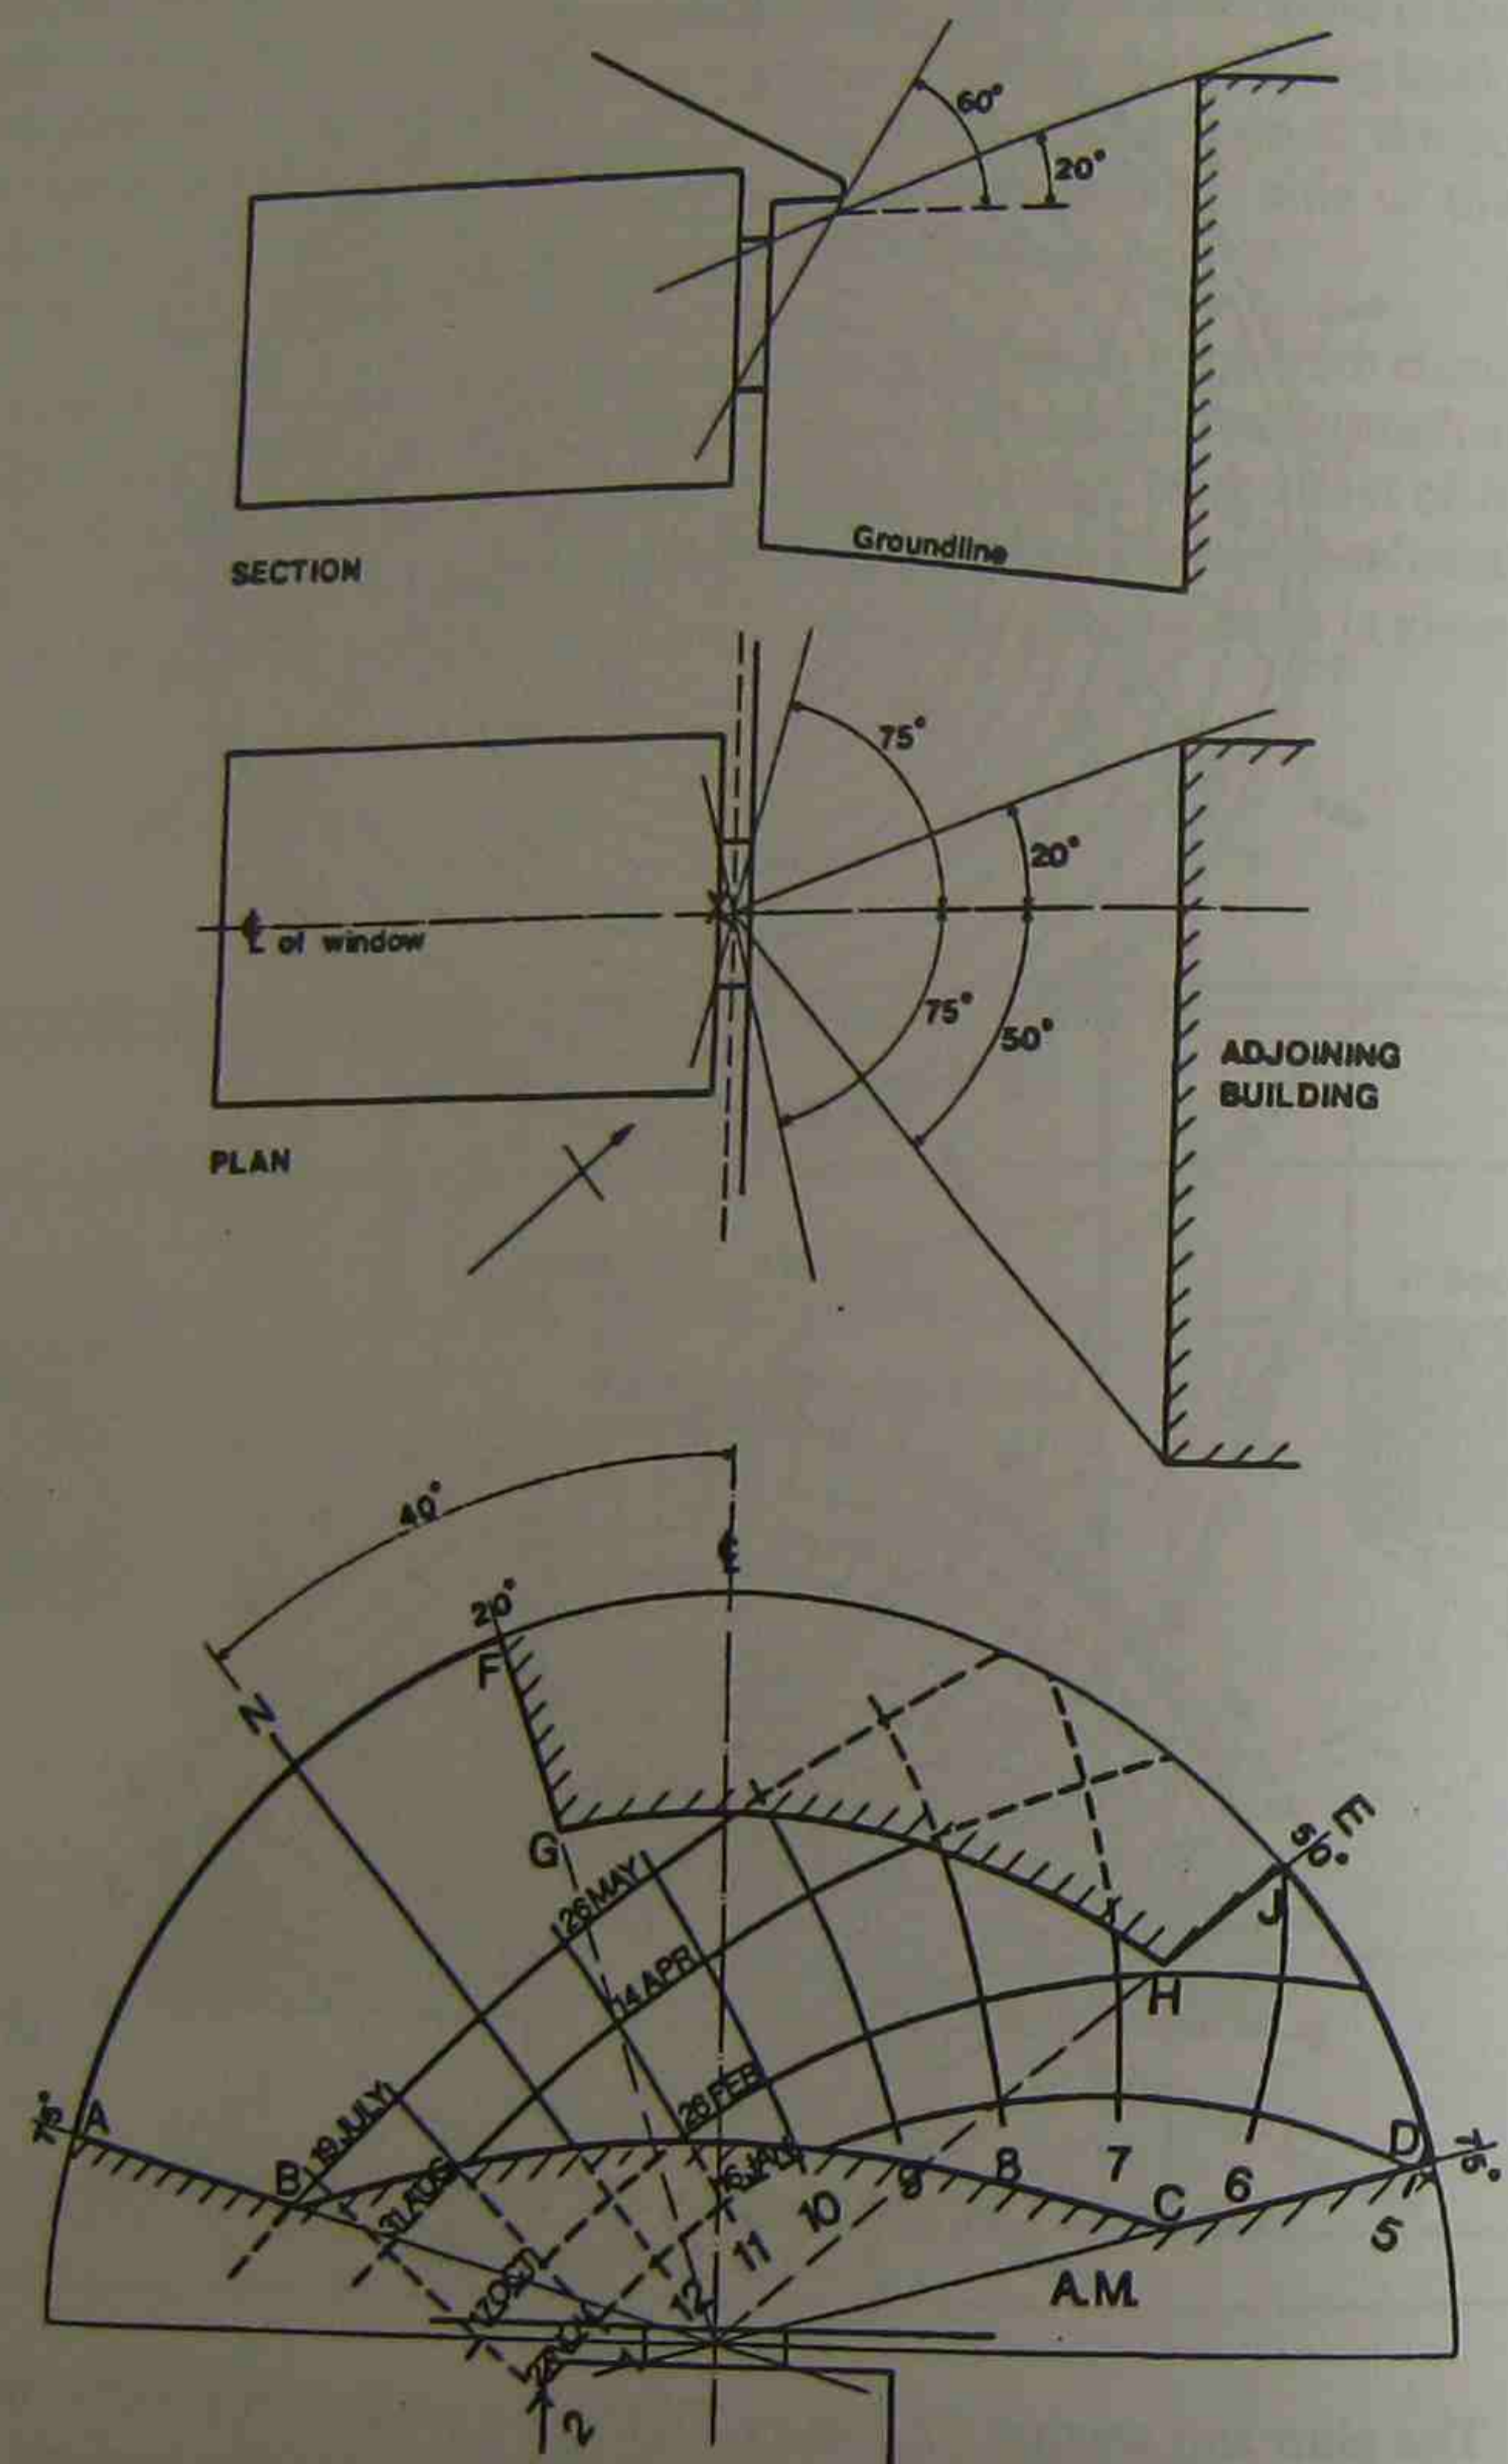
Determination of times when sunlight penetrates a window. (a) Plan and section of buildings. (b) Diagram of sunlight "cut-off" lines and sun paths for latitude 37.5°S. (Source: Phillips, 1975).
